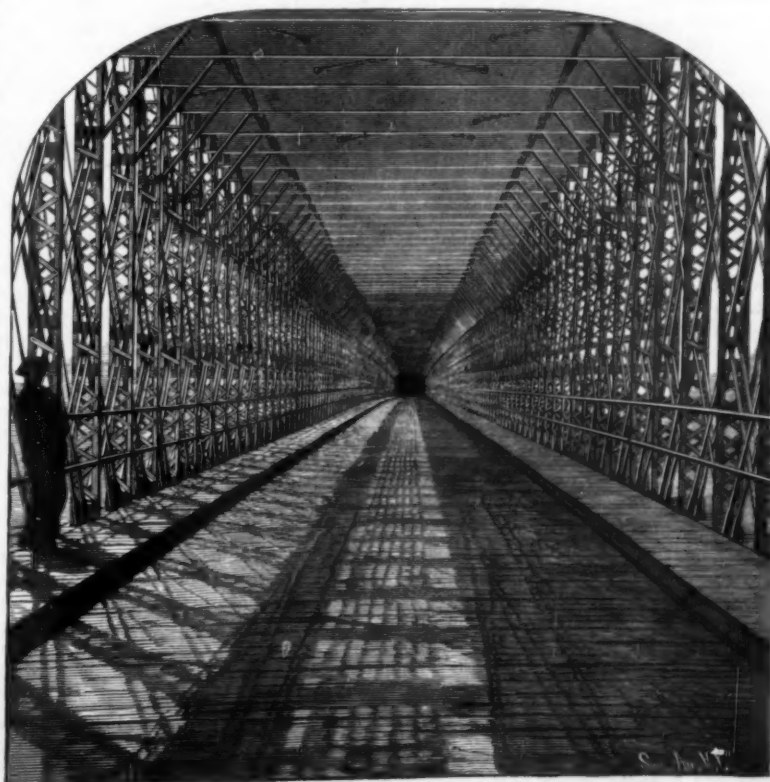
CARRIAGE WAY, SHOWING TRUSSES.
